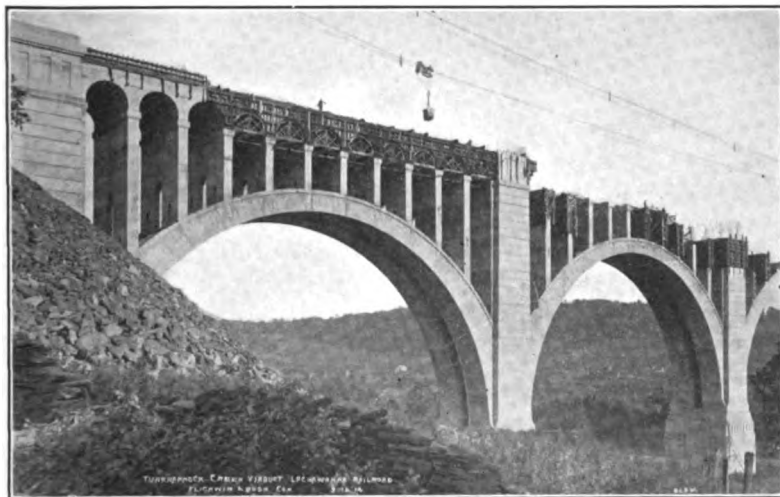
Tunkhannock viaduct. Completed arch ribs for two 180-ft. spans. Transverse spandrel walls, pier pilasters, and spandrel arches being concreted.
